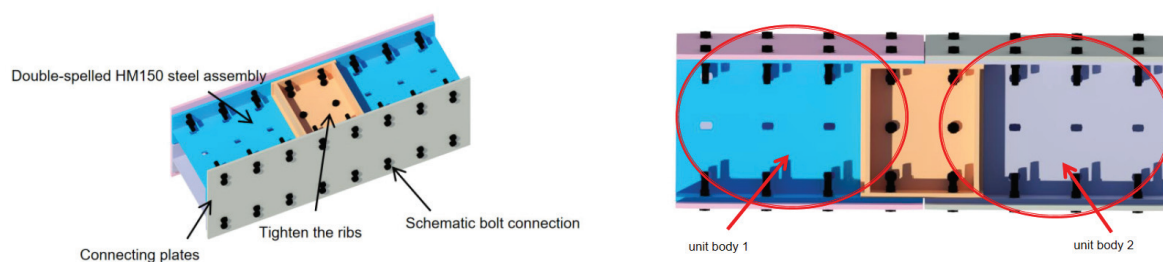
Construction and assembly joints of the prefabricated H-shaped steel main unit. Note: The colours in the diagram distinguish different assembly components.
